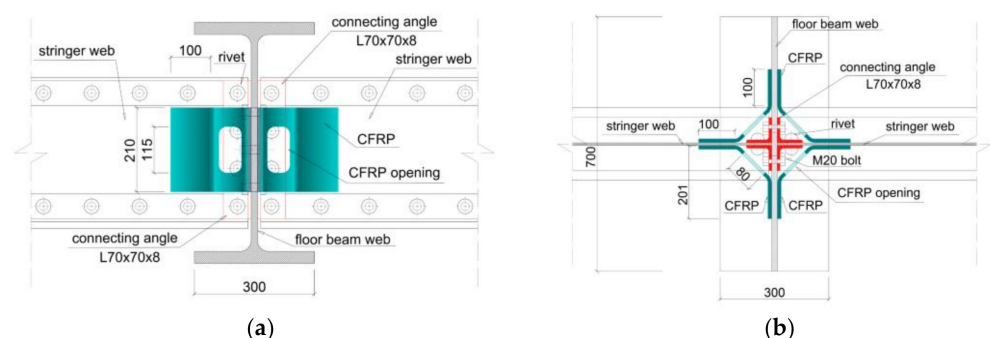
CFRP strengthening system for fatigue-prone detail (all dimensions in mm). (a) Lateral view. (b) Plan view.
